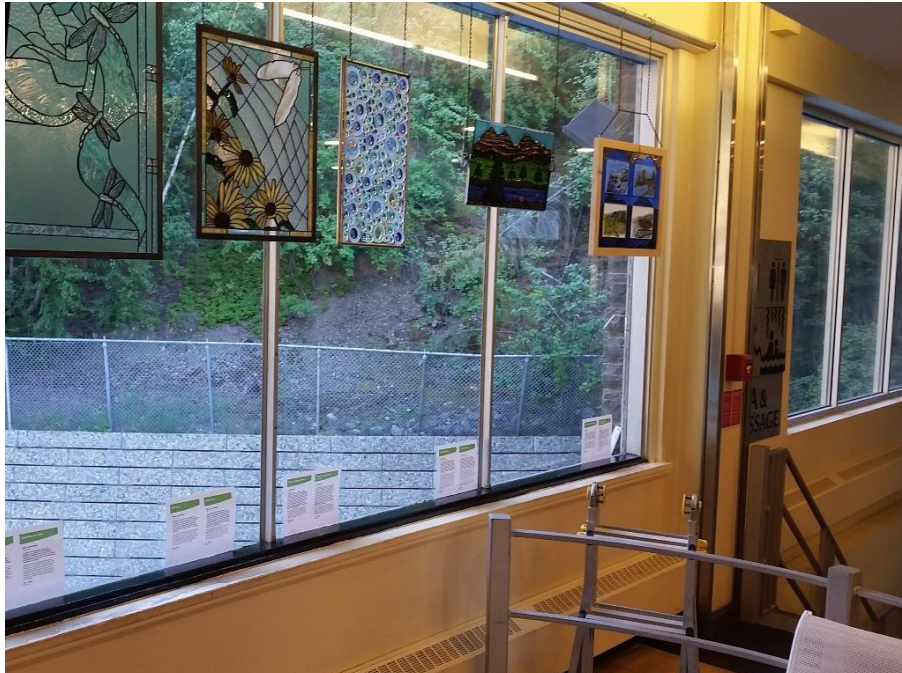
Silver Lead-Based Paint on Exterior Bathroom Window Frames
